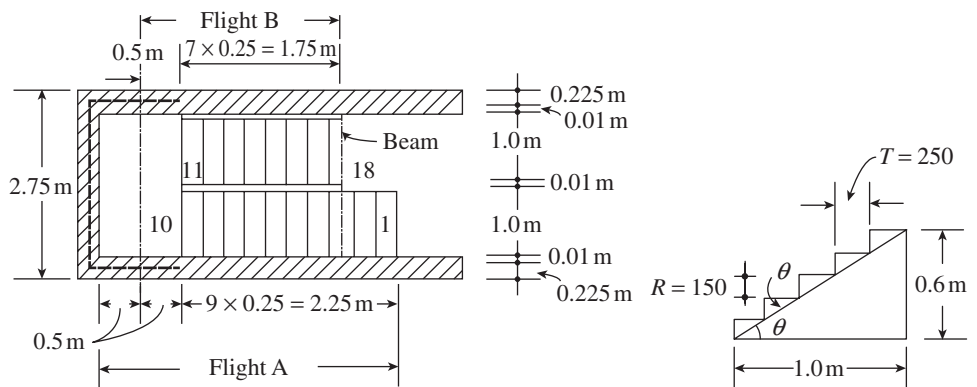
Longitudinally supported waist-type stair of Example 17.5
